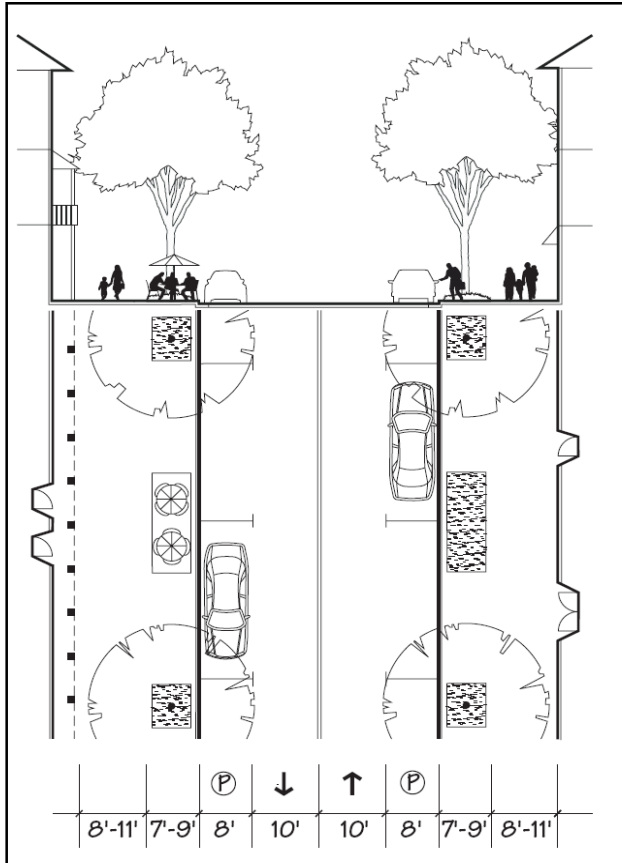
14: Mixed-Use Street: The curb-to-curb dimension should be the minimum necessary for parallel parking on both sides and fire access (typically 20 feet clear). Sidewalks should be 14 to 20 feet wide overall, leaving generous space for planting, cafes and street furniture, such as benches and tables.
